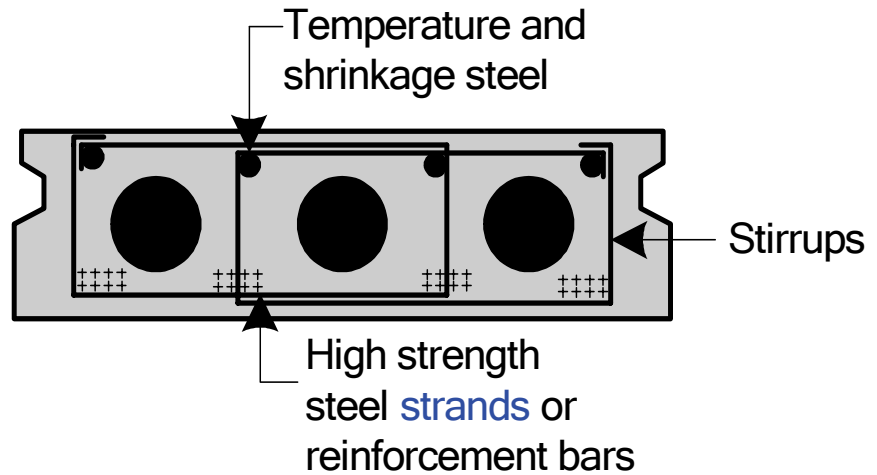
Prestressed Slab Beam Bridge Reinforcement
